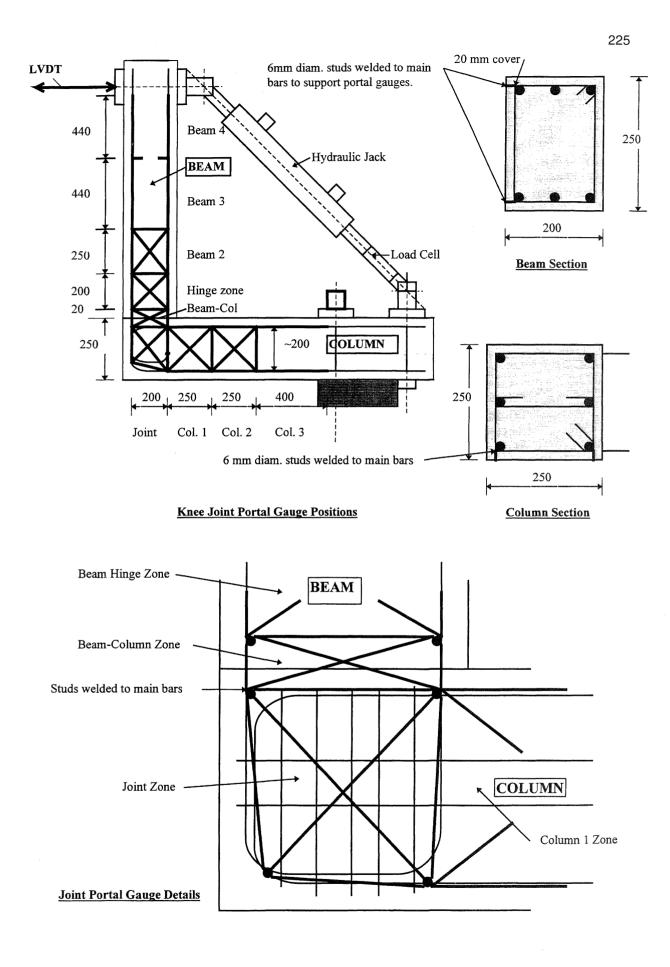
Portal Transducer Gauge positions on studs welded to main reinforcing bars.
